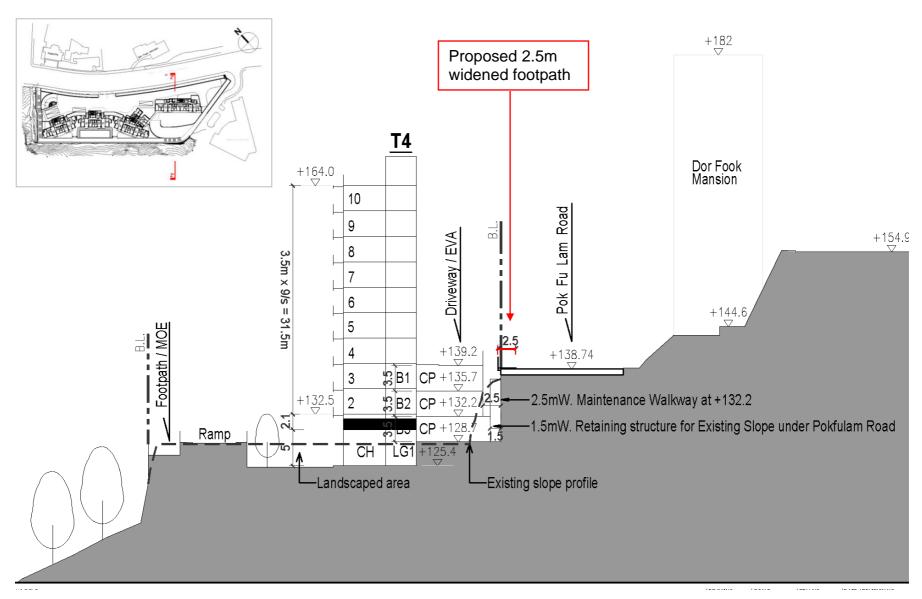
Section drawing showing proposed widening of public footpath on Pok Fu Lam Road
